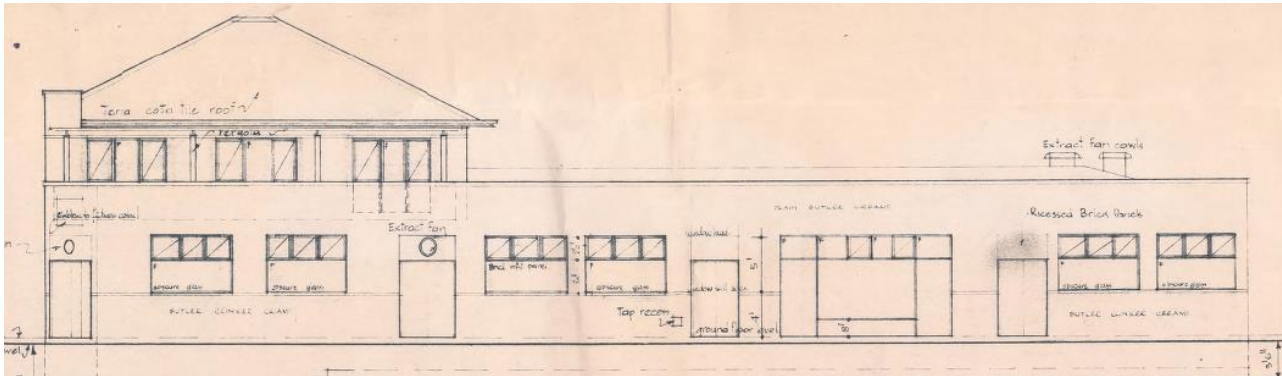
North elevation. Drawing related to building permit 57/1421. (Best Overend Architects, 1960) (Source: Council Building File)
